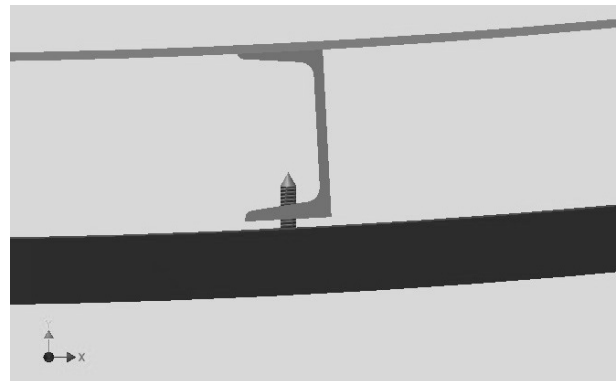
Connection of trapezoidal sheet metal and section – top-view [own elaboration]
